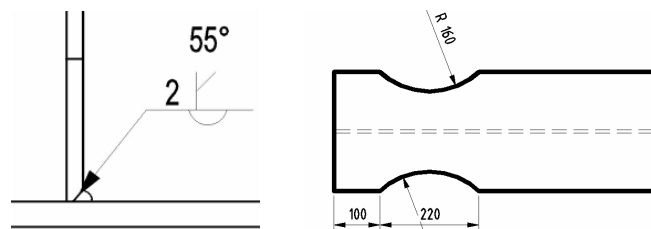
Beam-to-column weld and geometry of the reduced beam section.
